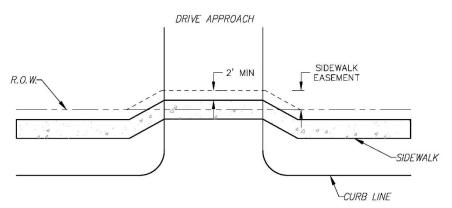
, Sidewalk Easement to Meet Drive Approach Slope
